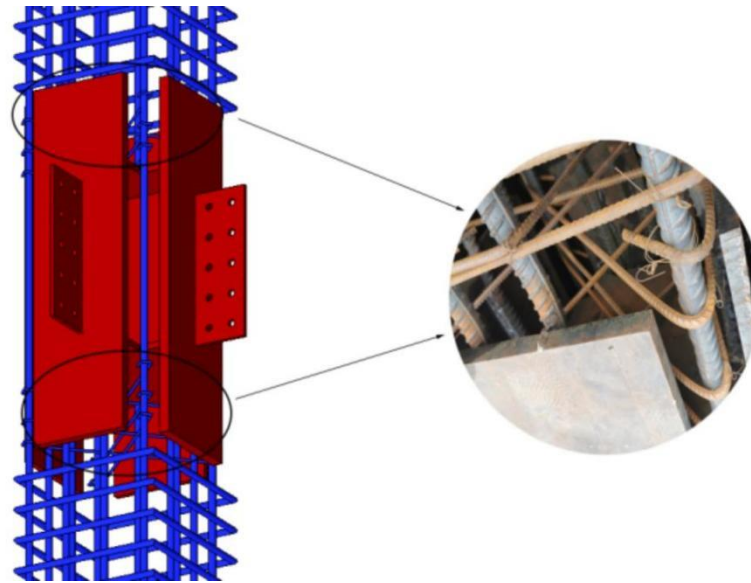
Connection diagram of reinforcing steel skeleton and joint steel embedded parts.
